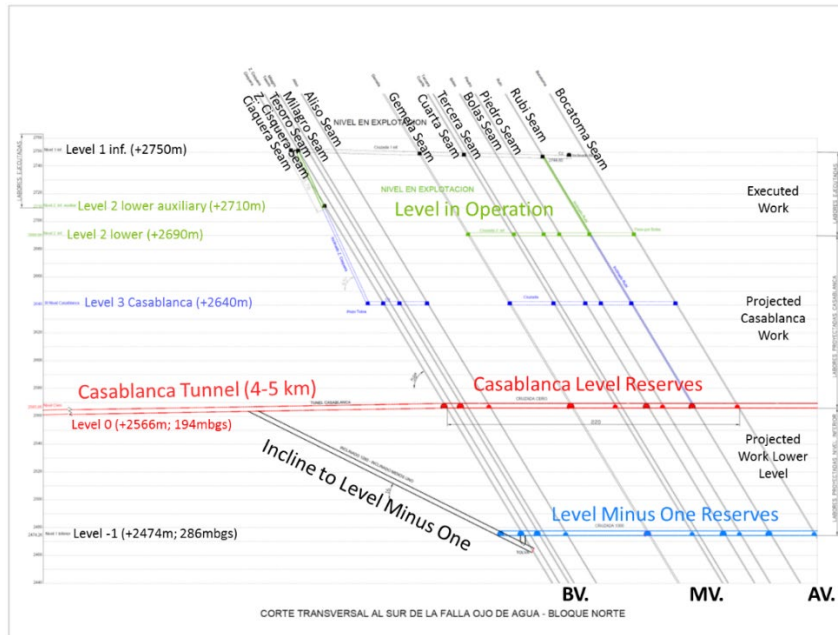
Cross-sectional view of the current and proposed drilling plan.
